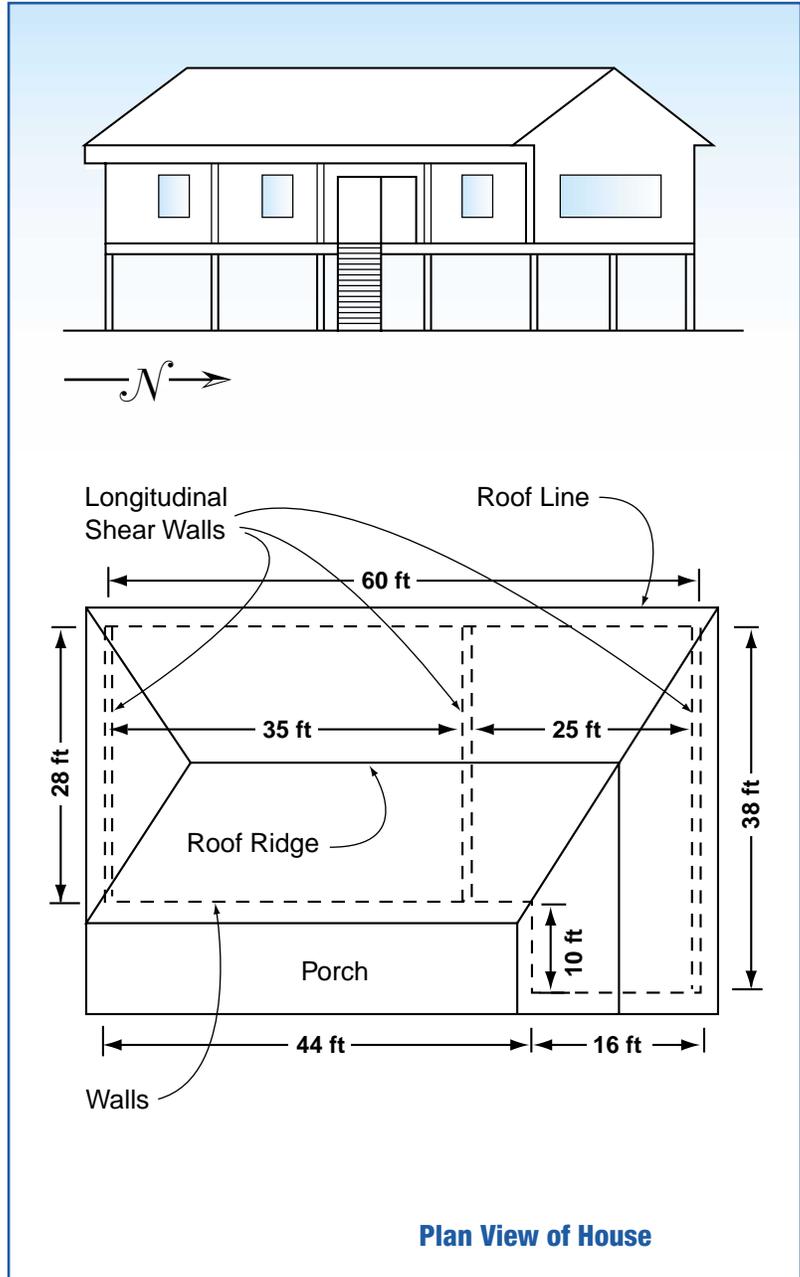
Building elevation and plan view of roof showing longitudinal shearwalls. Dimensions are wall-to-wall and do not include 2-foot roof overhang.
